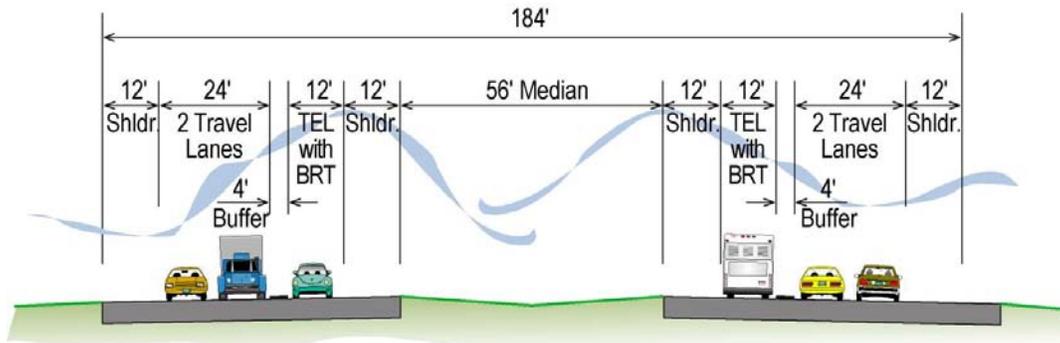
Package B Typical I-25 Cross Section - SH 66 to SH 7
